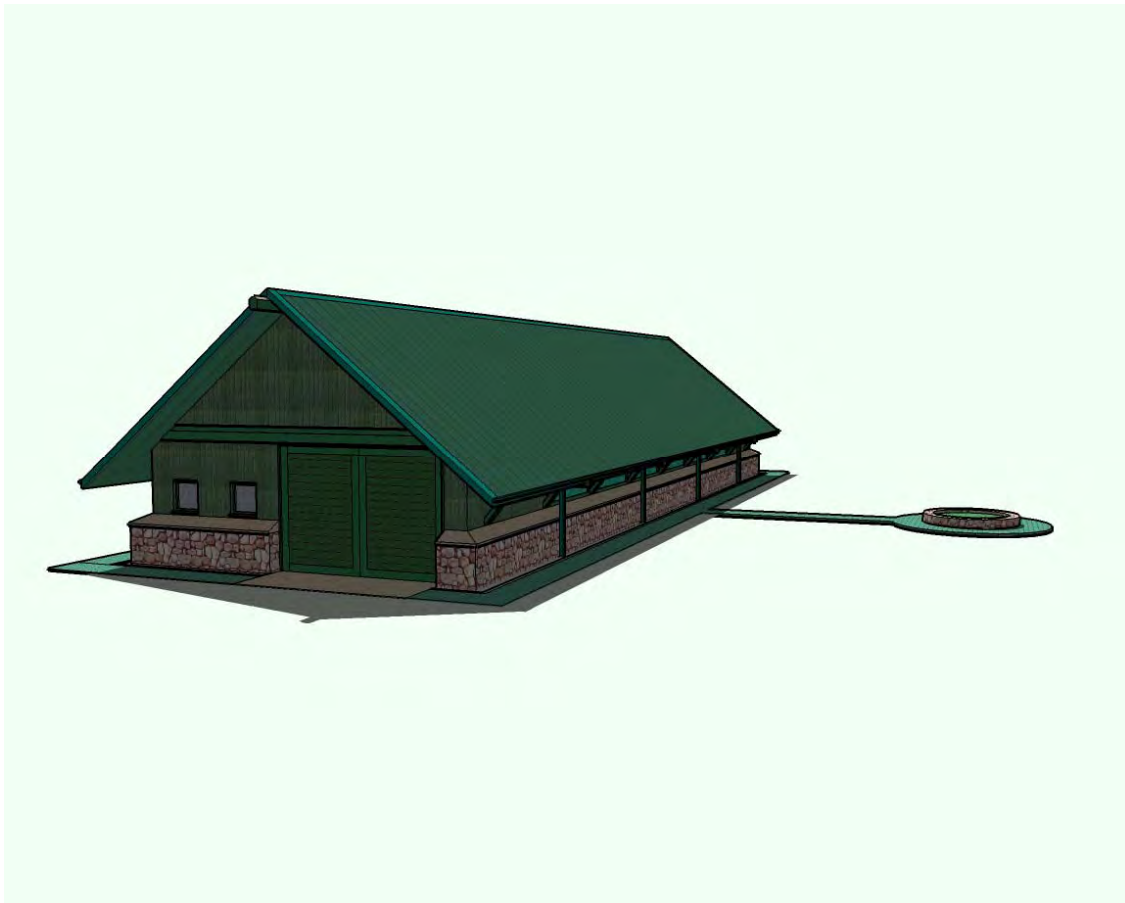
Control building – Indicative south west elevation of the proposed longhouse designed control building
